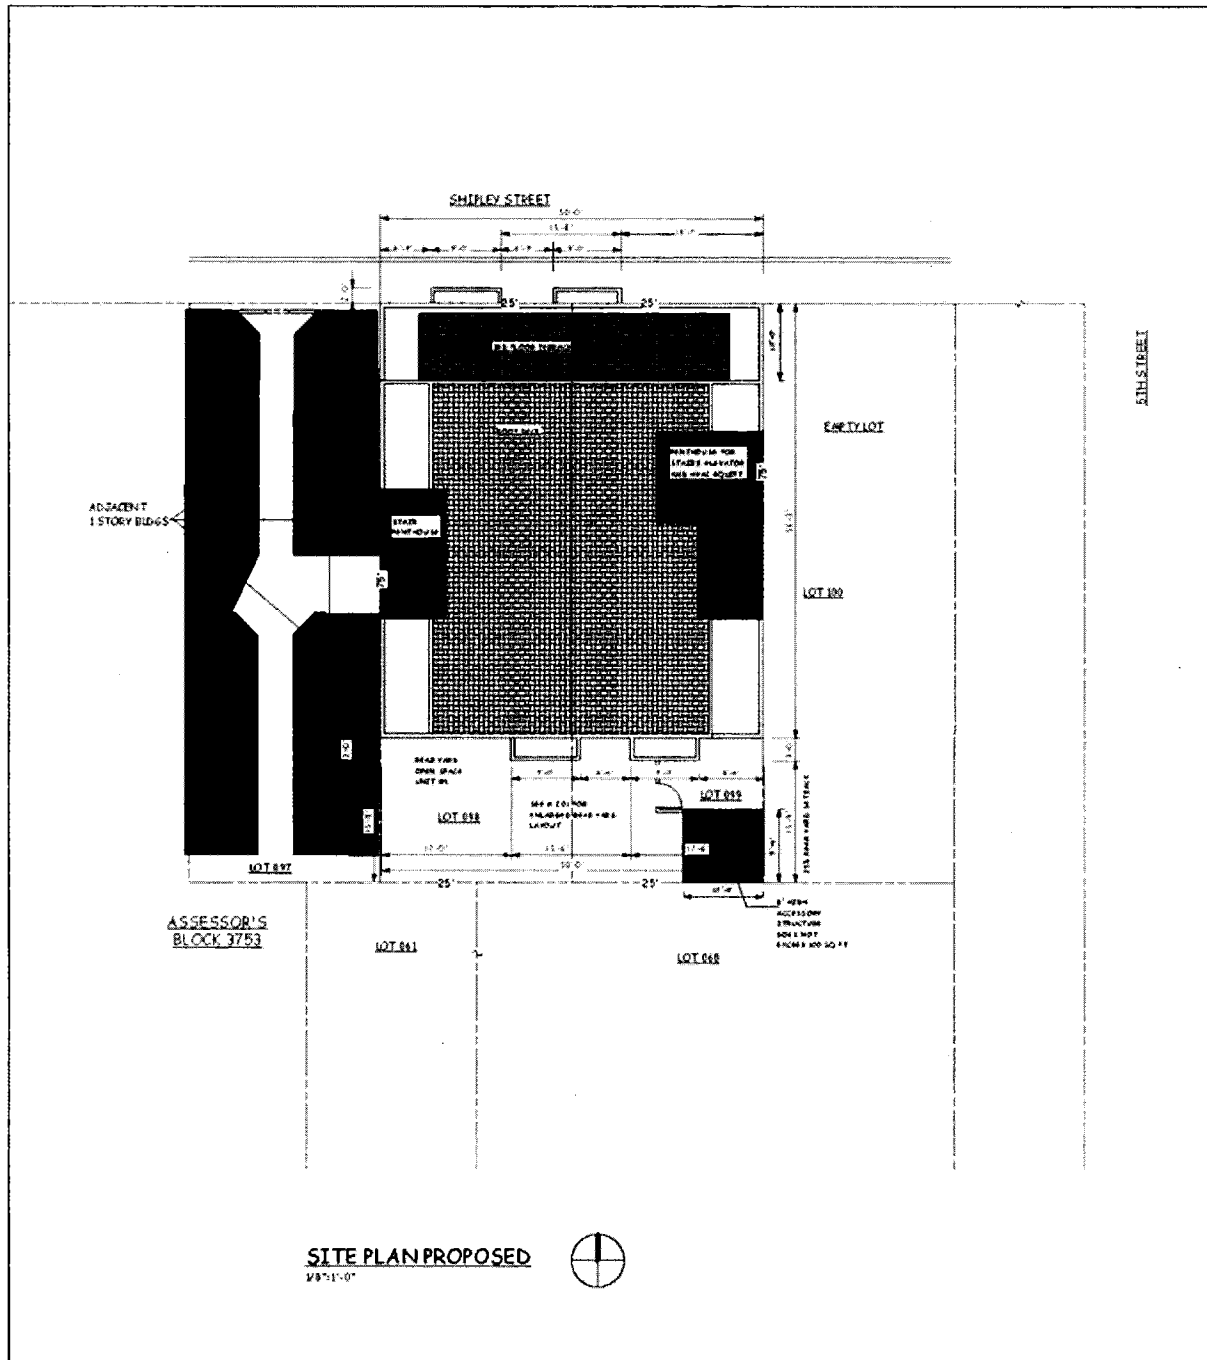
Proposed site plan (Source: William Pashelinsky Architect)
